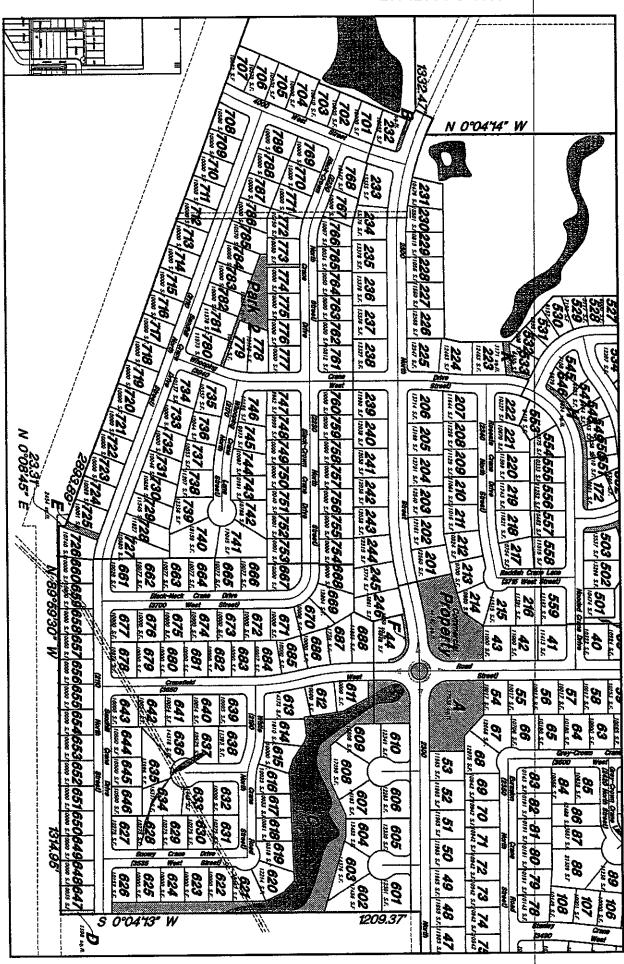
EXHIBIT "B" THE CRANE FIELD ESTATES SUBDIVISION PRUD PRELIMINARY PLAN (AMENDED)
